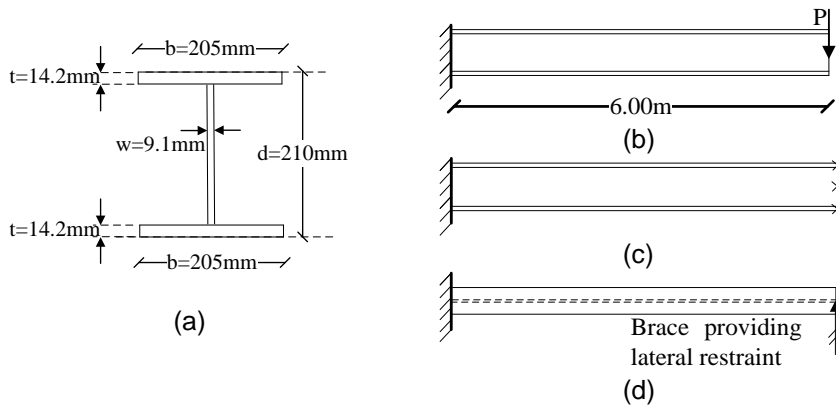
a) Cross section dimensions, b) 6.0m cantilever subjected to tip load, c) possible locations of lateral braces, d) plan view showing the lateral support
